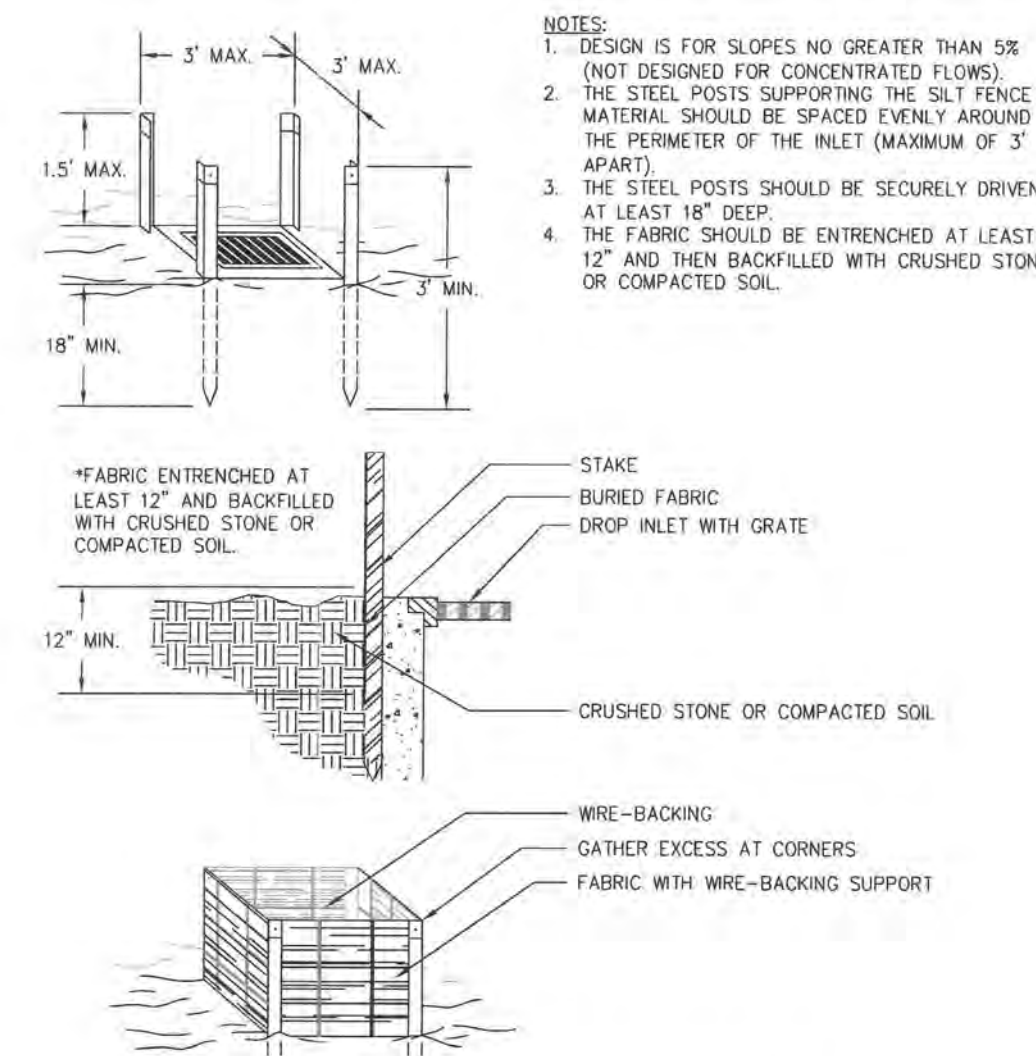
Fabric and Supporting Frame for Inlet Protection
